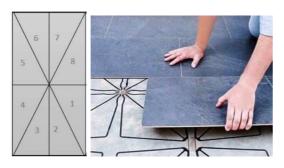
Floor details: Left) the eight sectioning of one *SensFloor* module. Right) Installation detail (*SensFloor* is covered by the desired floor).
